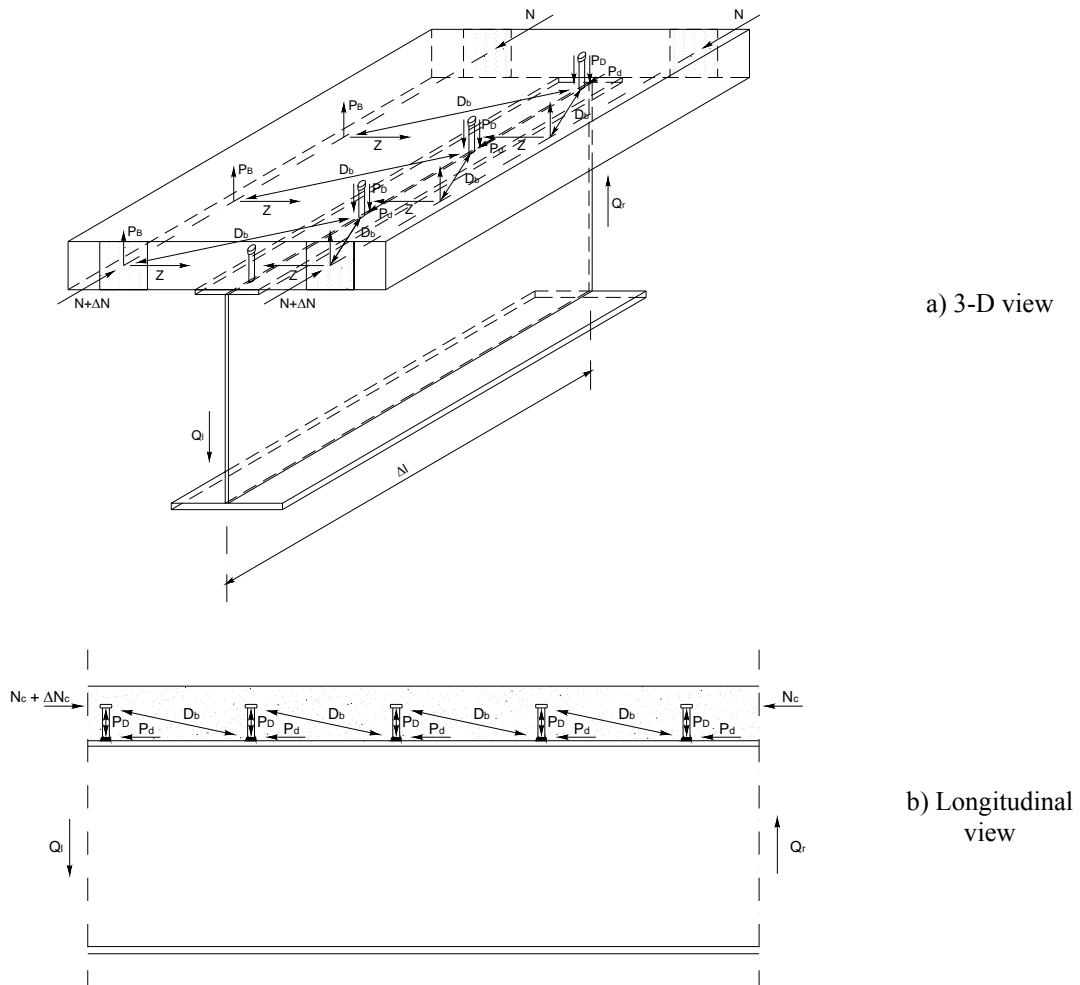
Flux of forces on a steel and concrete composite beam, (Roik et al 1988)
